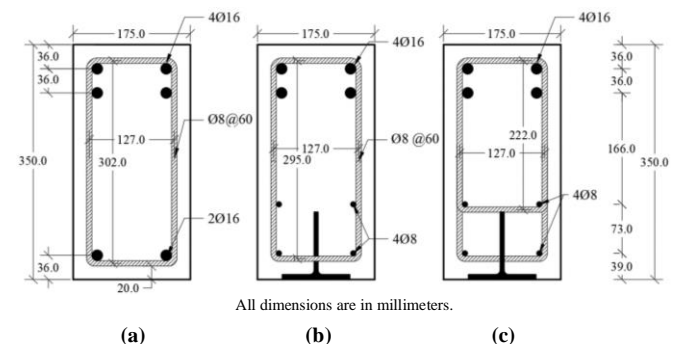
Cross-section details, (a) RC beam, (b) CRC beam with 100 % degree of shear connection, (c) CRC beam with degree of shear connection less than 100 %.
